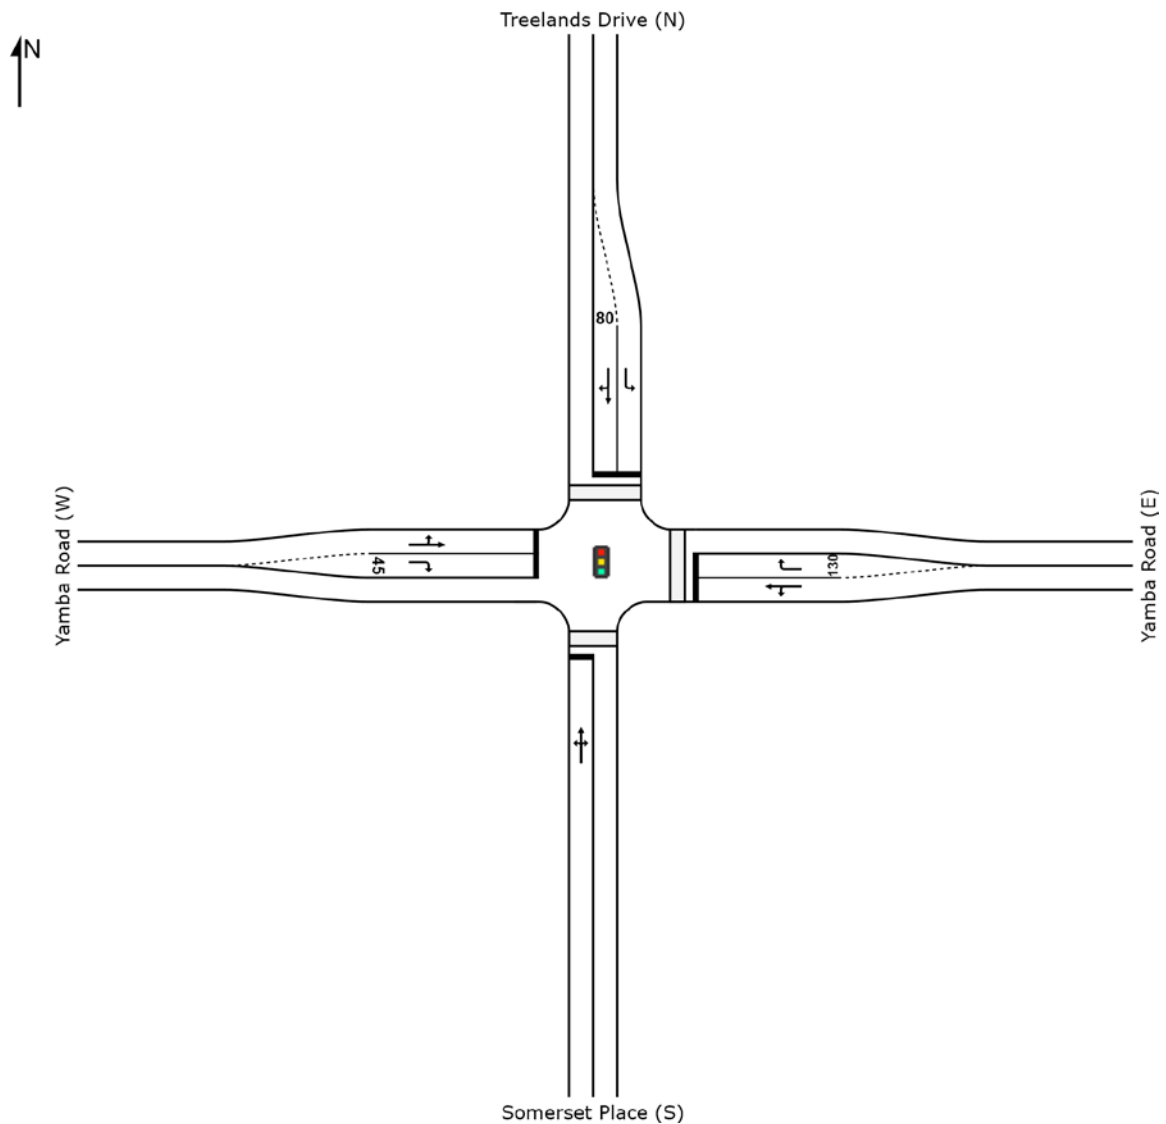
Treelands Drive / Yamba Road Intersection – Proposed Signalised Upgrade
